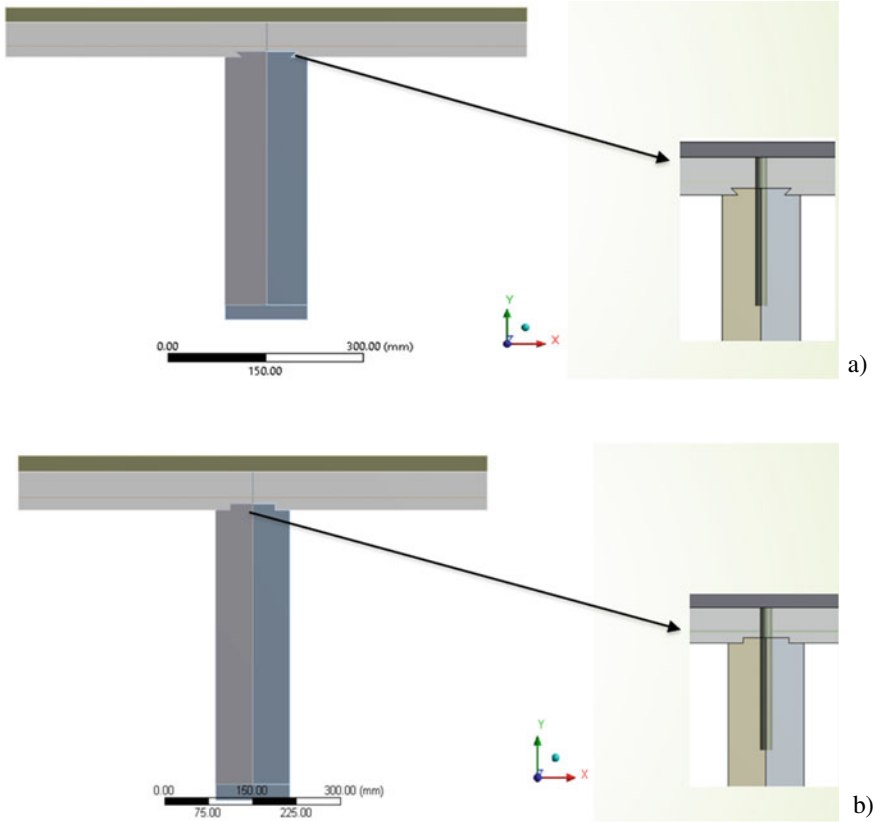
TCC beam with interlocking joints a) Dovetail joint b) Rectangular joint
